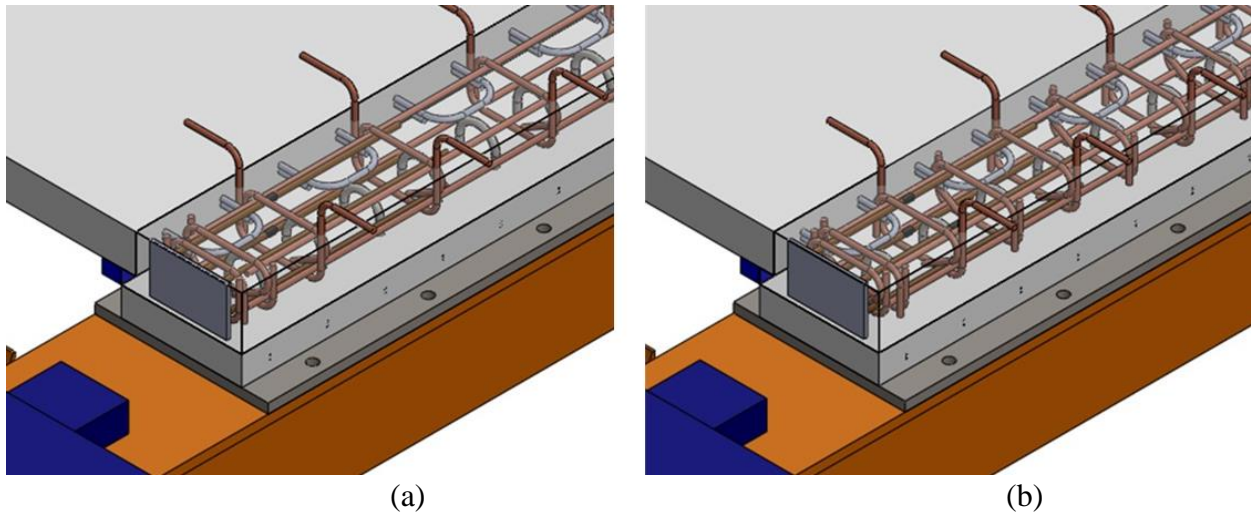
Reinforcement Detail at (a) 12" Spacing and (b) 6" Spacing
